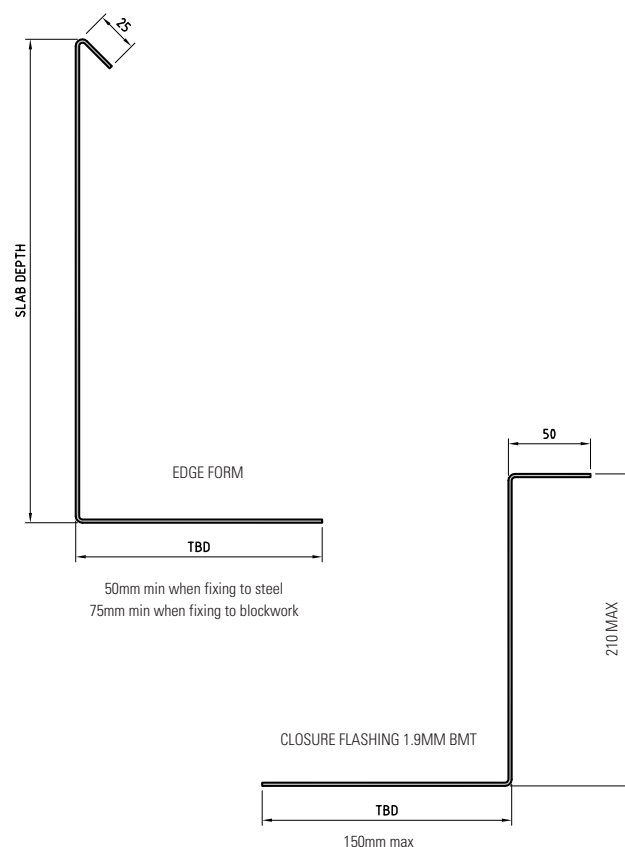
SlimDek 210® Edge Form and Closure Flashing Dimensions
